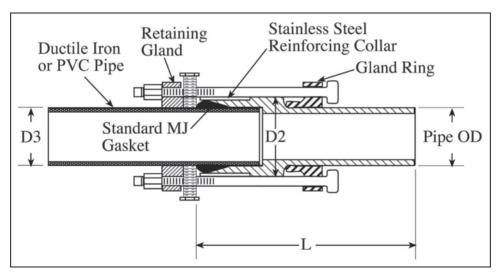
Connection to Existing PVC or DI Pipes Using Female MJ Adapter
